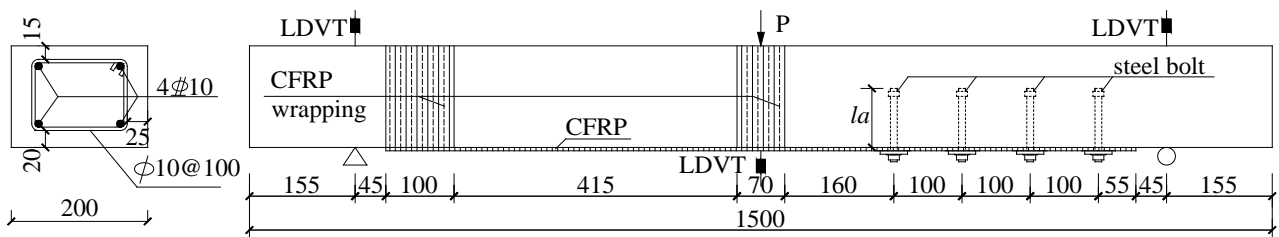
Geometry and reinforcement arrangement (unit: mm)
